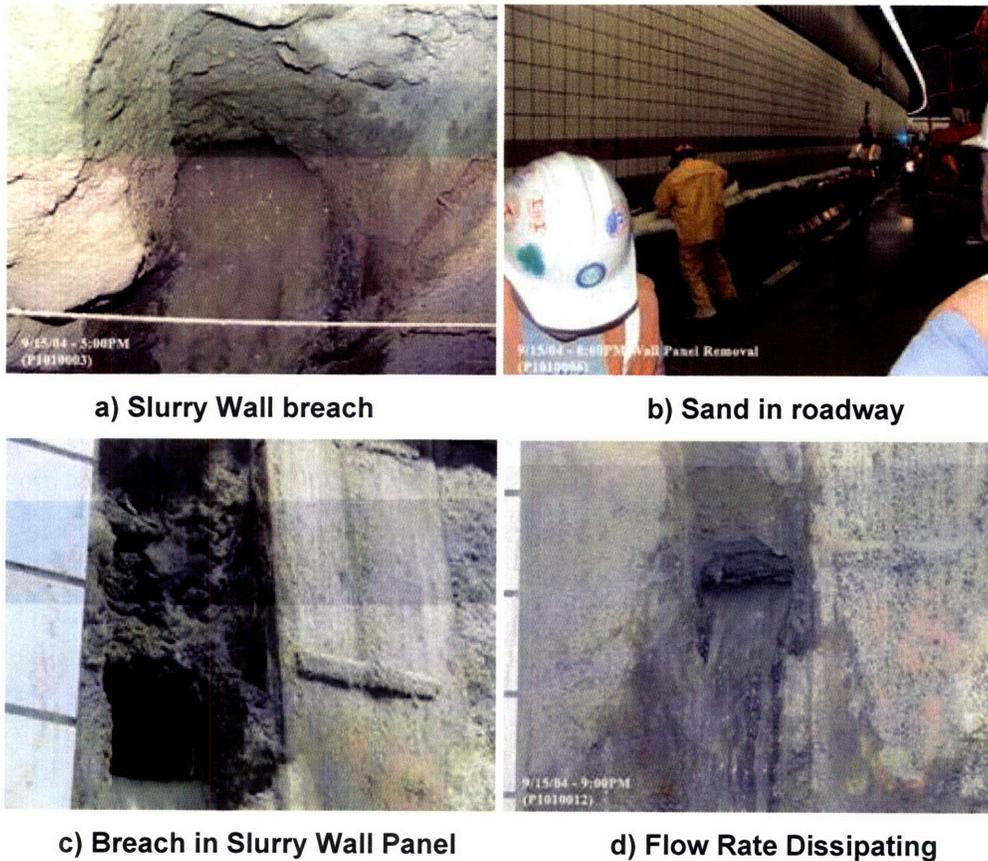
, CA/T Slurry Wall Breach – September 2004, (FHWA 2005)
